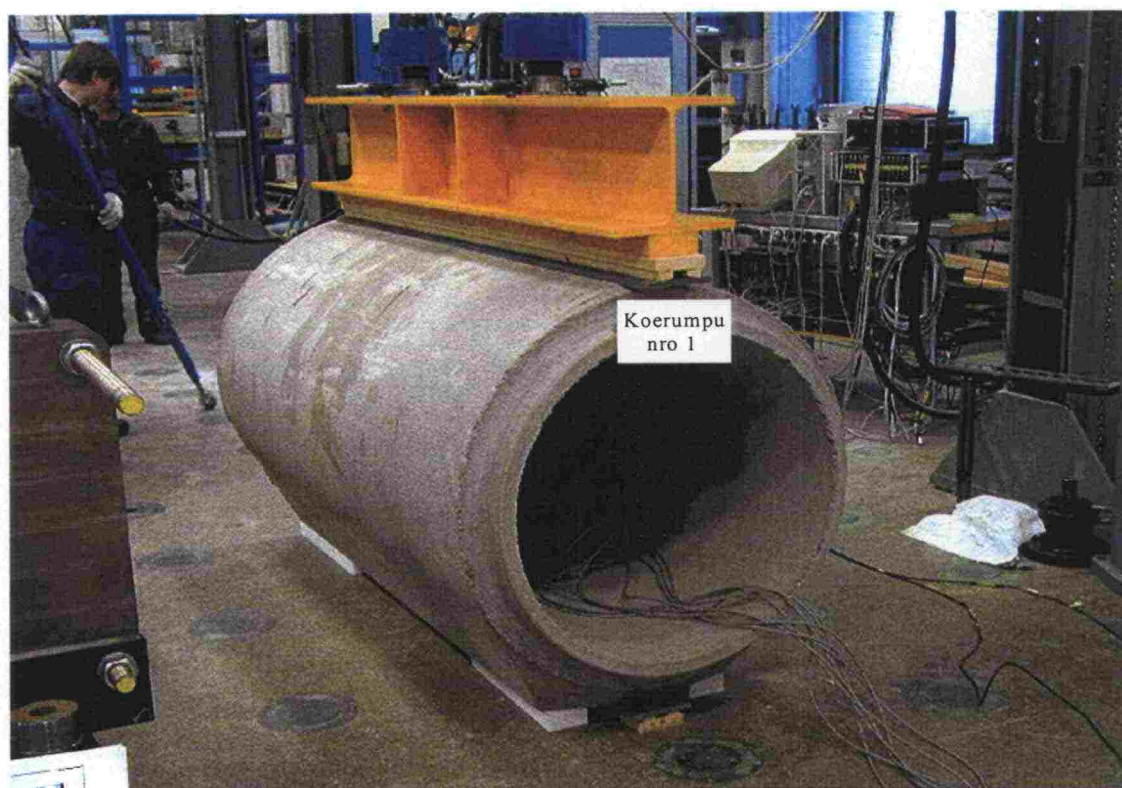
1 Loading arrangement in the loading test of the concrete culvert at TUT.
